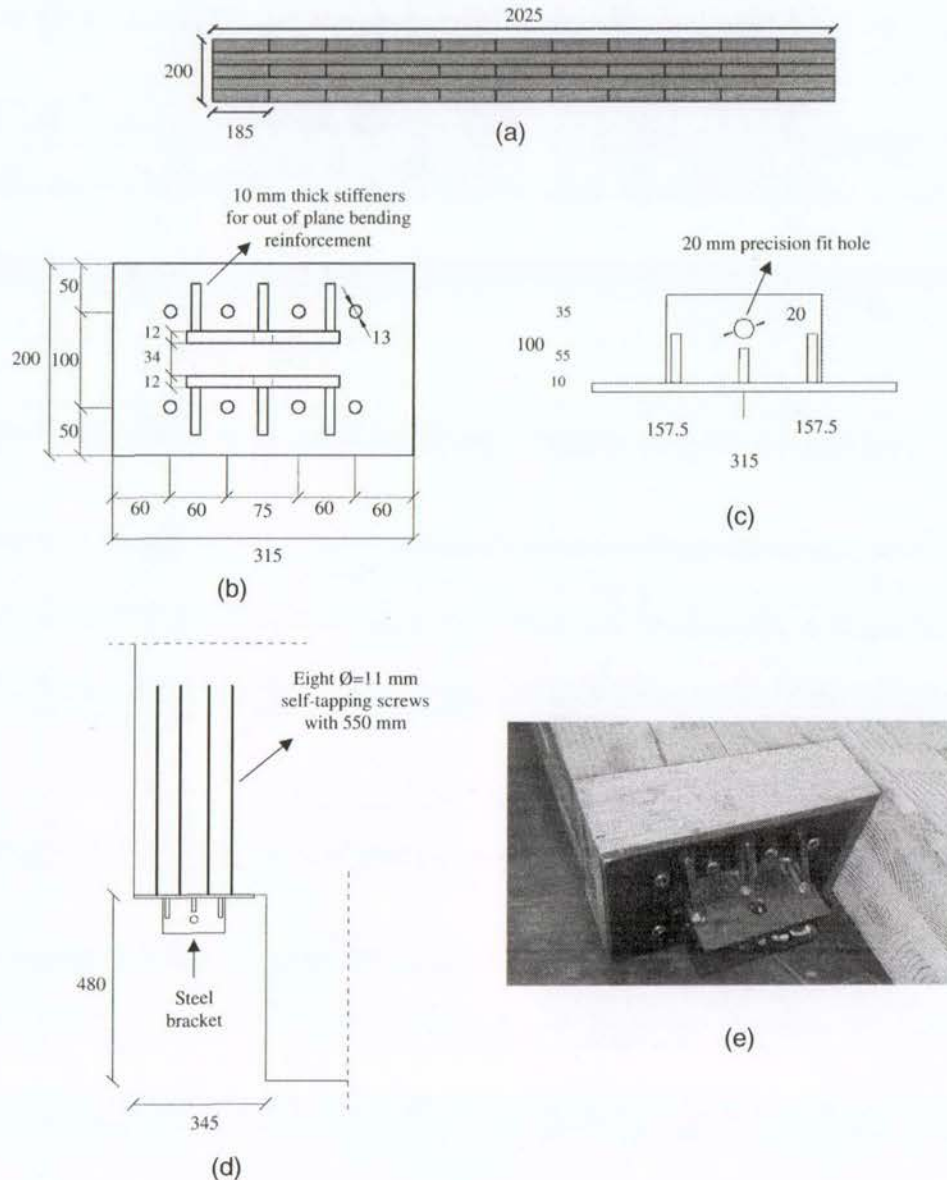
Tested CLT specimen (dimensions in millimeters): (a) schematic cross section; (b) steel bracket connecting the RSF joint to the wall (plan view); (c) steel bracket connecting the RSF joint to the wall (side view); (d) position of the brackets at the notches and the screws; (e) assembly of the bracket connecting the RSF joint to the CLT panel
